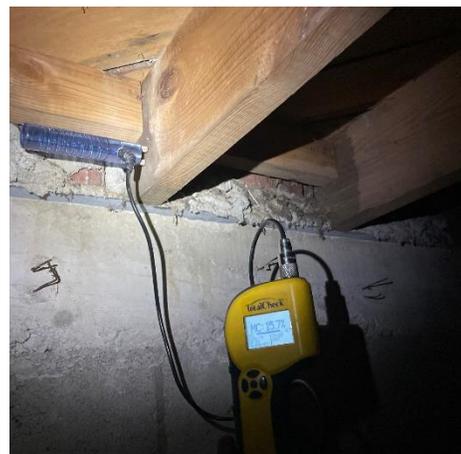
Elevated moisture content measurements at rim joist near building entrance.
